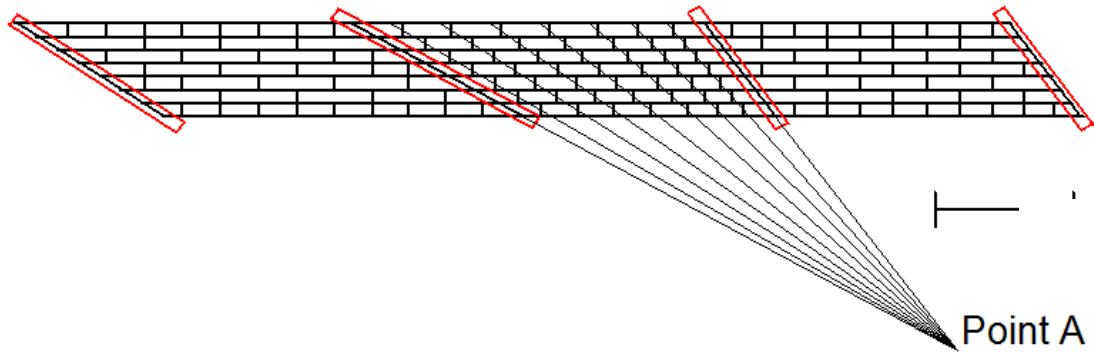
Additional alternative framing arrangement for bridge EISSS2.
